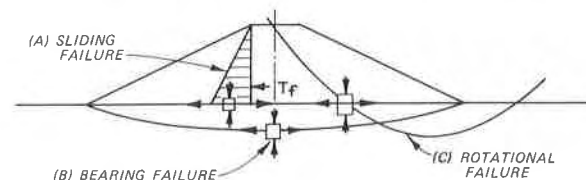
Potential failure mode that might occur for fabric-reinforced embankments
